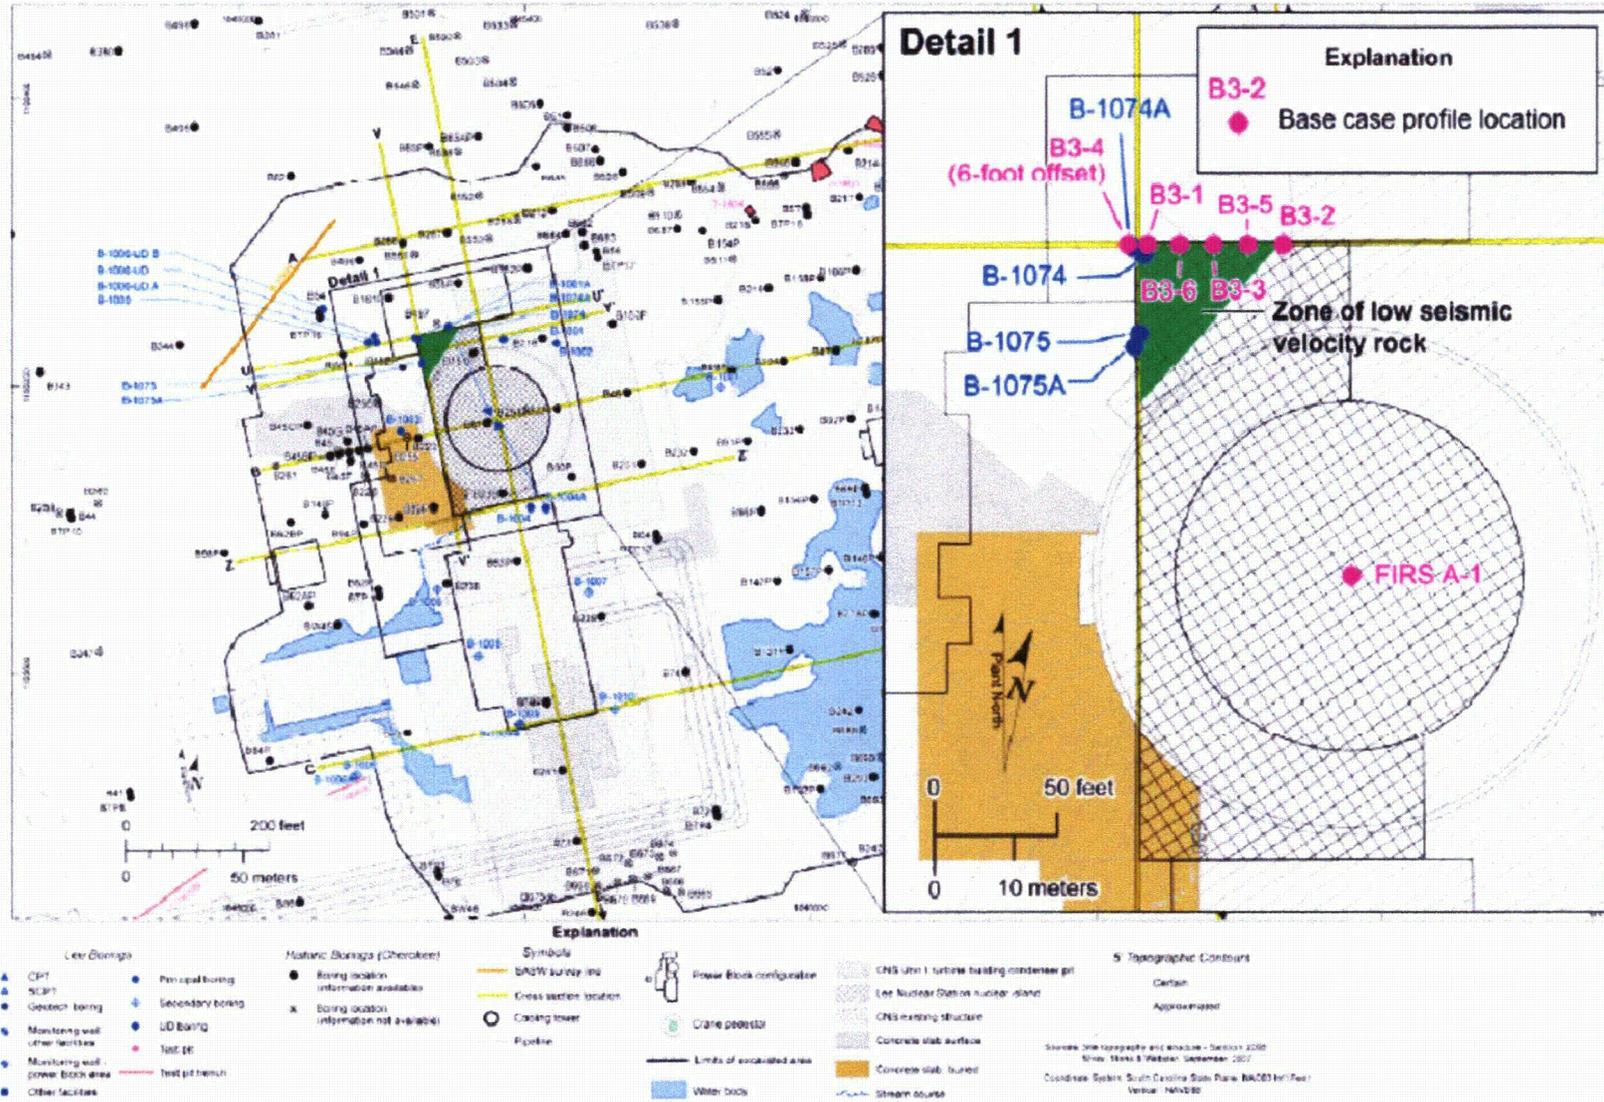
Duke Lee Site Plan – Unit 1 Northwest Corner
